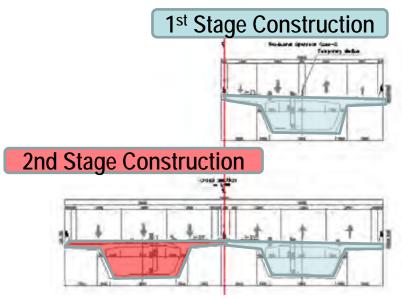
Typical Cross Section of Main Bridge (Stage Construction)
